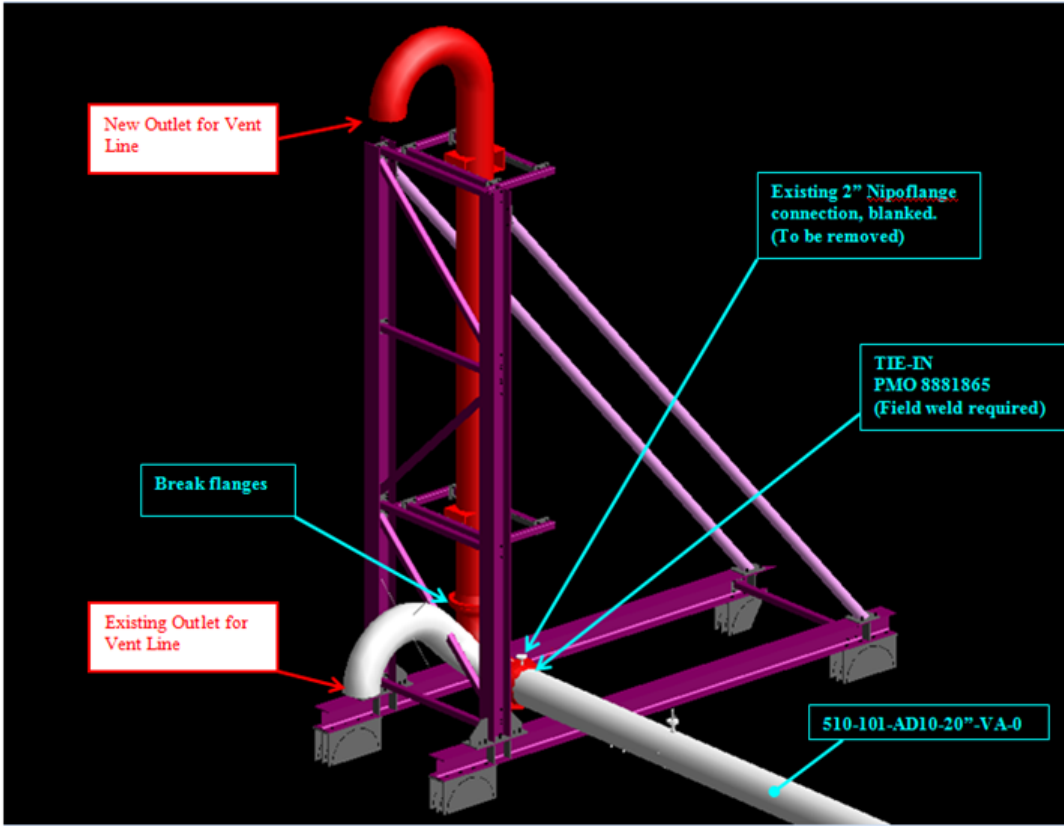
A vertically extended pipe spool for the Open End on the bridge
